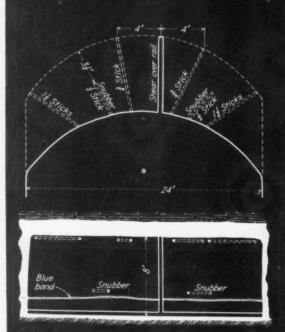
Drilling plan for a sheared place, Orient No. 1 mine, showing short snubbing holes.
